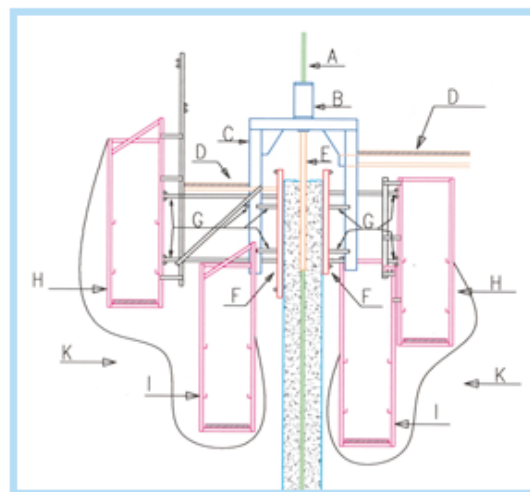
Typical Cross Section of Slipform (ENDEM Co.).
